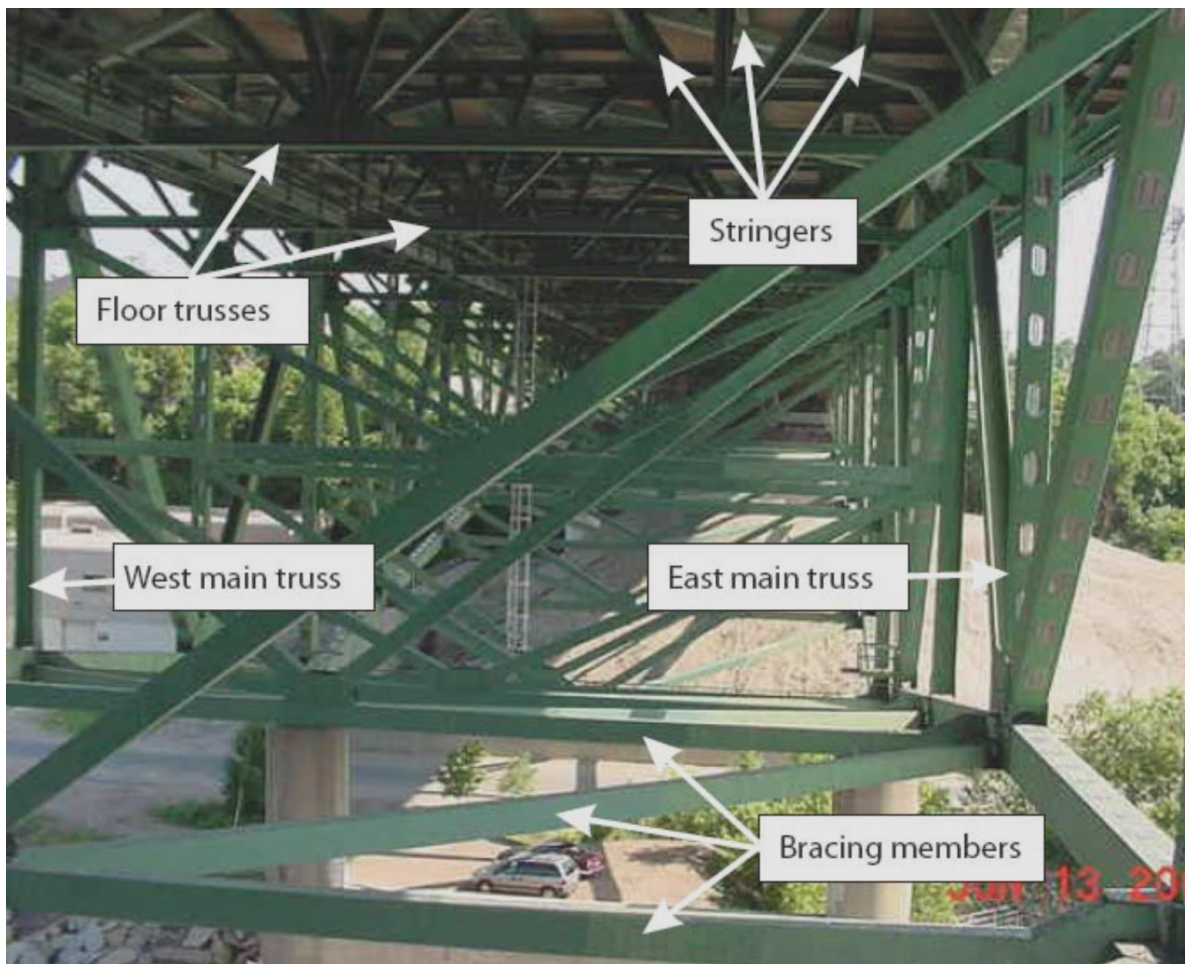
Major components in the bridge truss system viewing in a transverse direction. NTSB (2009). Collapse of I-35W Highway Bridge, Minneapolis, Minnesota, August 1, 2007. National Transportation Safety Board. Used under fair use, 2015.
